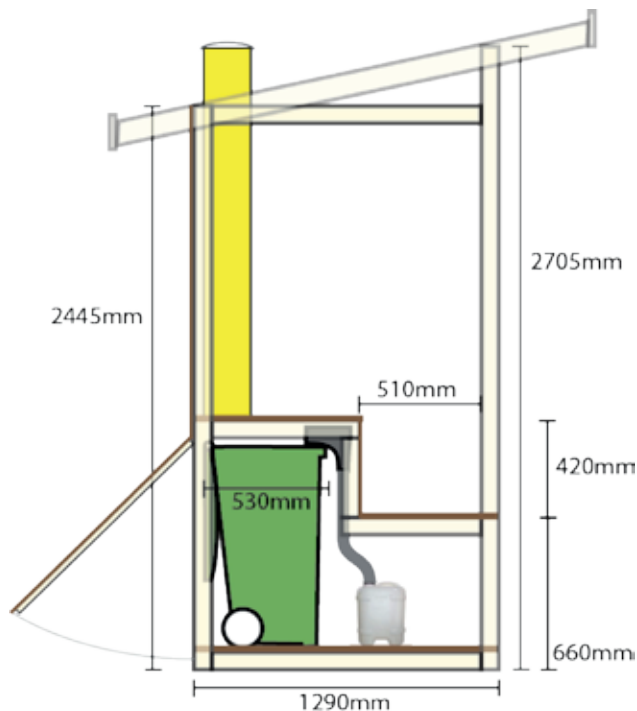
typical dry toilet design using wheelie bins in a batch process
